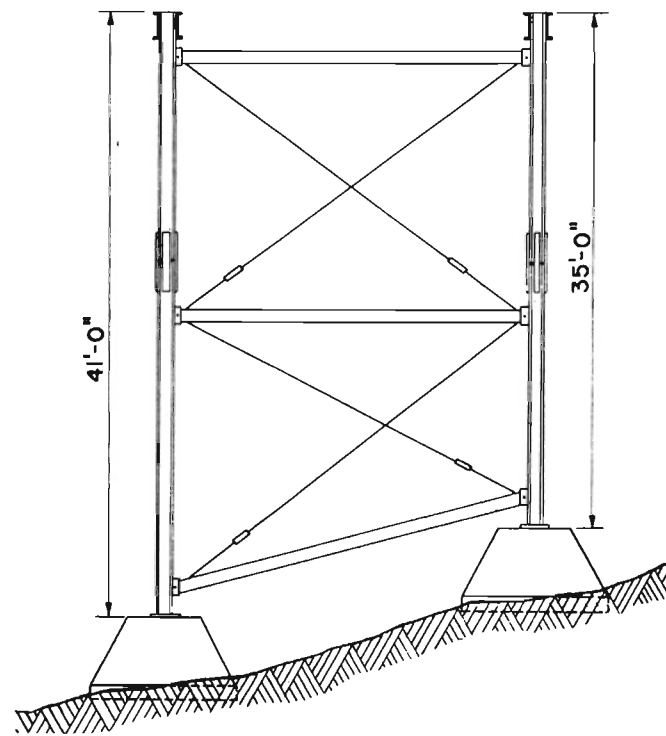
Bracing of framed steel tower modified to suit footings set at different levels.
